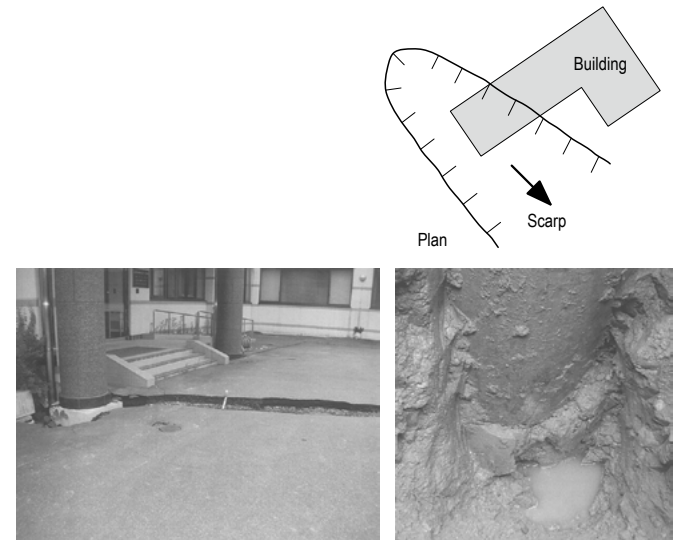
Shear failure of pile foundation at a cut and fill boundary (Yamagoshi-mura, Niigata prefecture)
